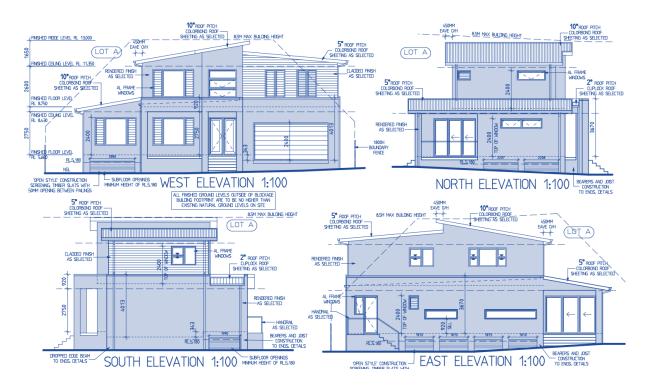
Extract from the approved architectural plan set showing the elevations for Dwelling A (Bishop Street)
